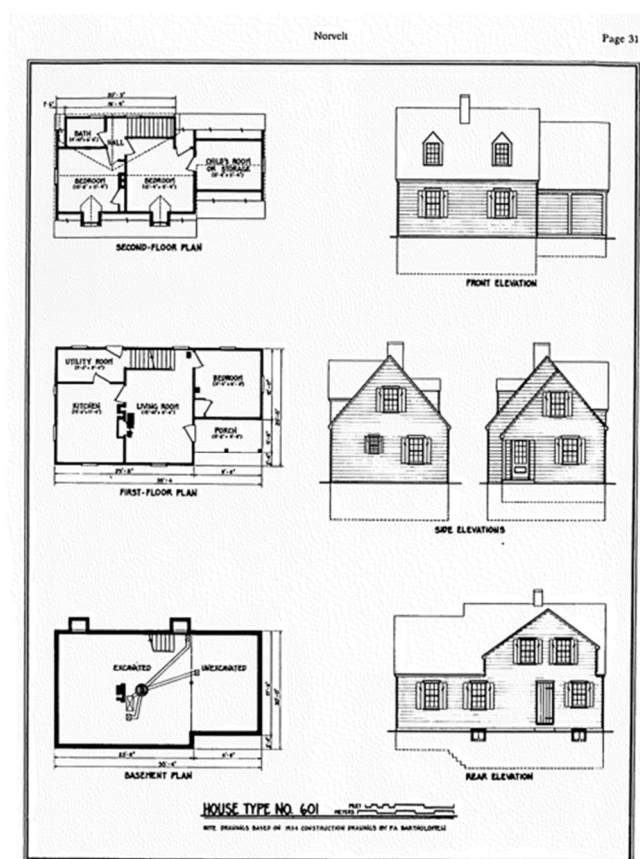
Plans and elevations of Type 601 house. Delineator: Isabel C. Yang, HABS.
